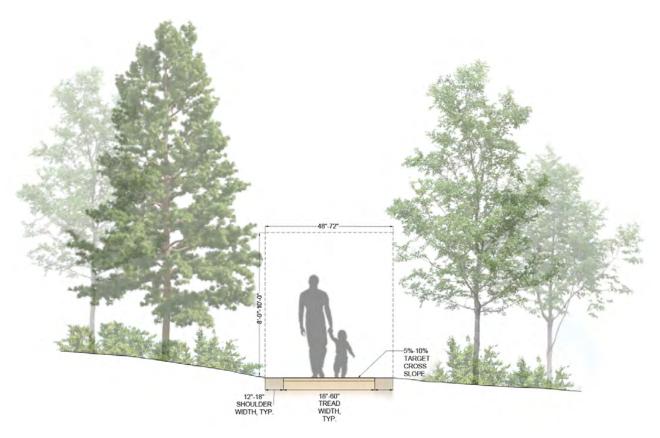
CLASS 4 MULTI-USE TRAIL ELEVATION
